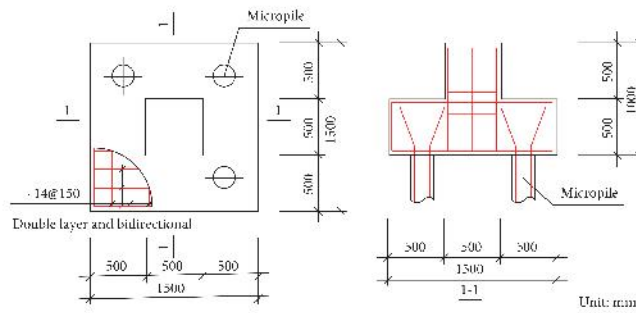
Dimensions and reinforcement layout of the cast-in-situ reinforced concrete pile foundation.
